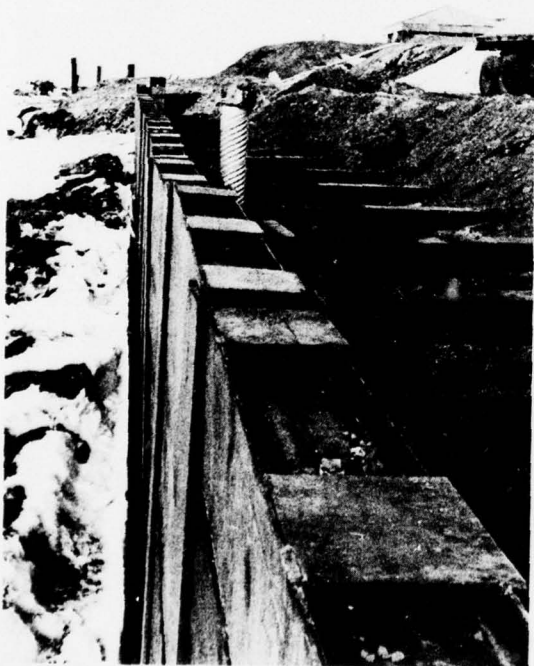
Protective face of steel and timber in place on ice wharf.
